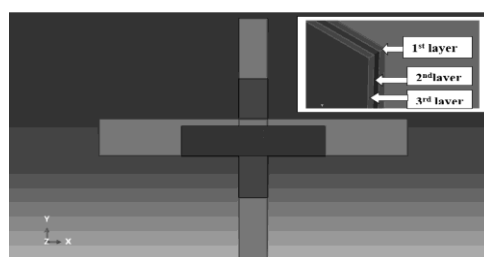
Retrofitted beam-column joint with three layers of TRM.
